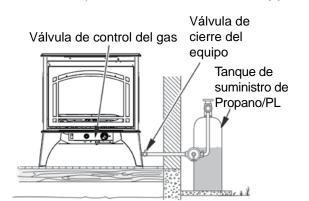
Checking Gas Joints (Propane/LP Only)
